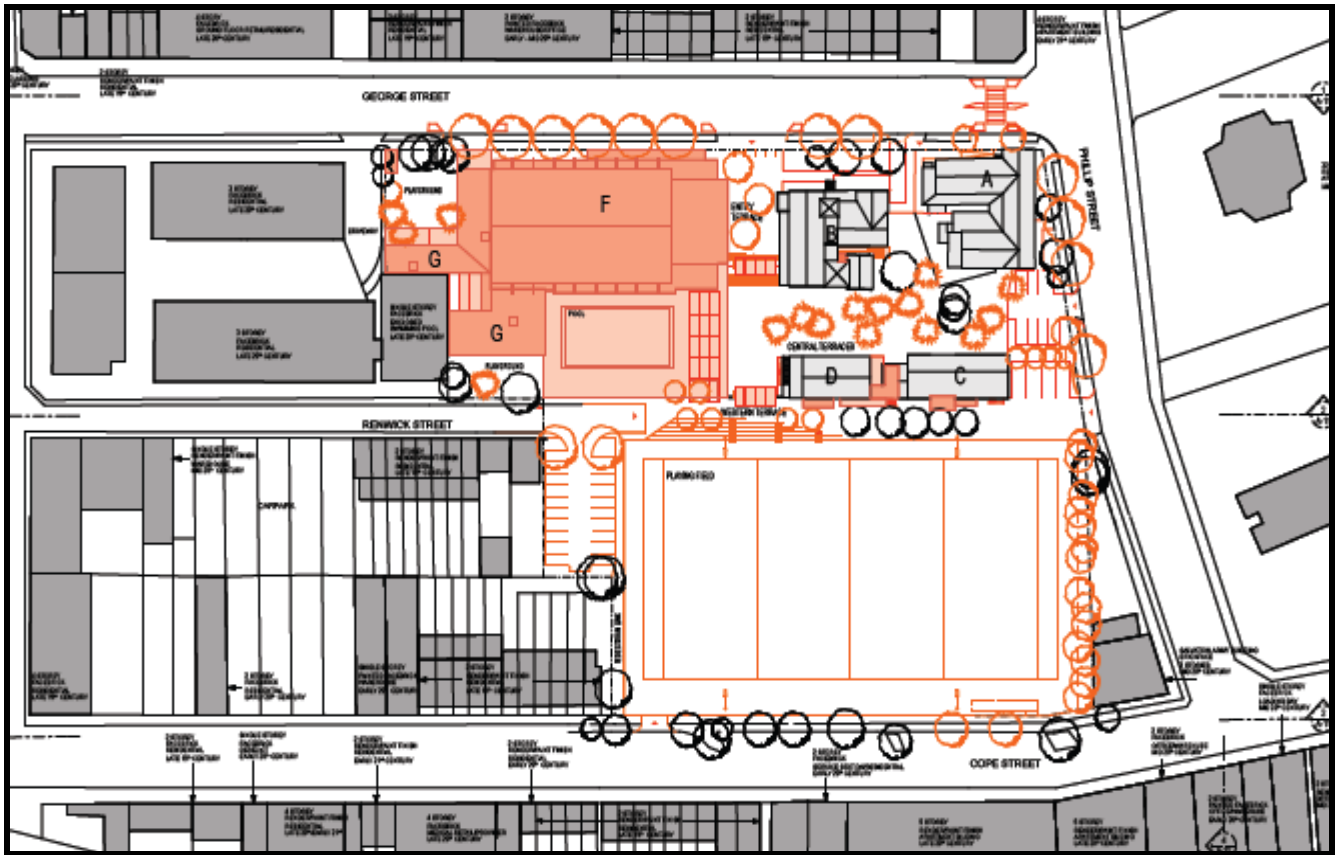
Proposed Site Layout detailing the existing buildings in light grey and the new works highlighted in orange.
